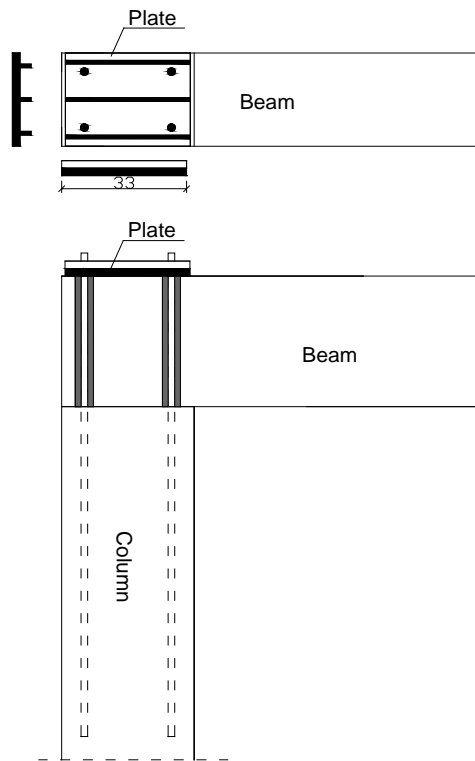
Strengthening dowels by a large steel plate to prevent all failure modes
